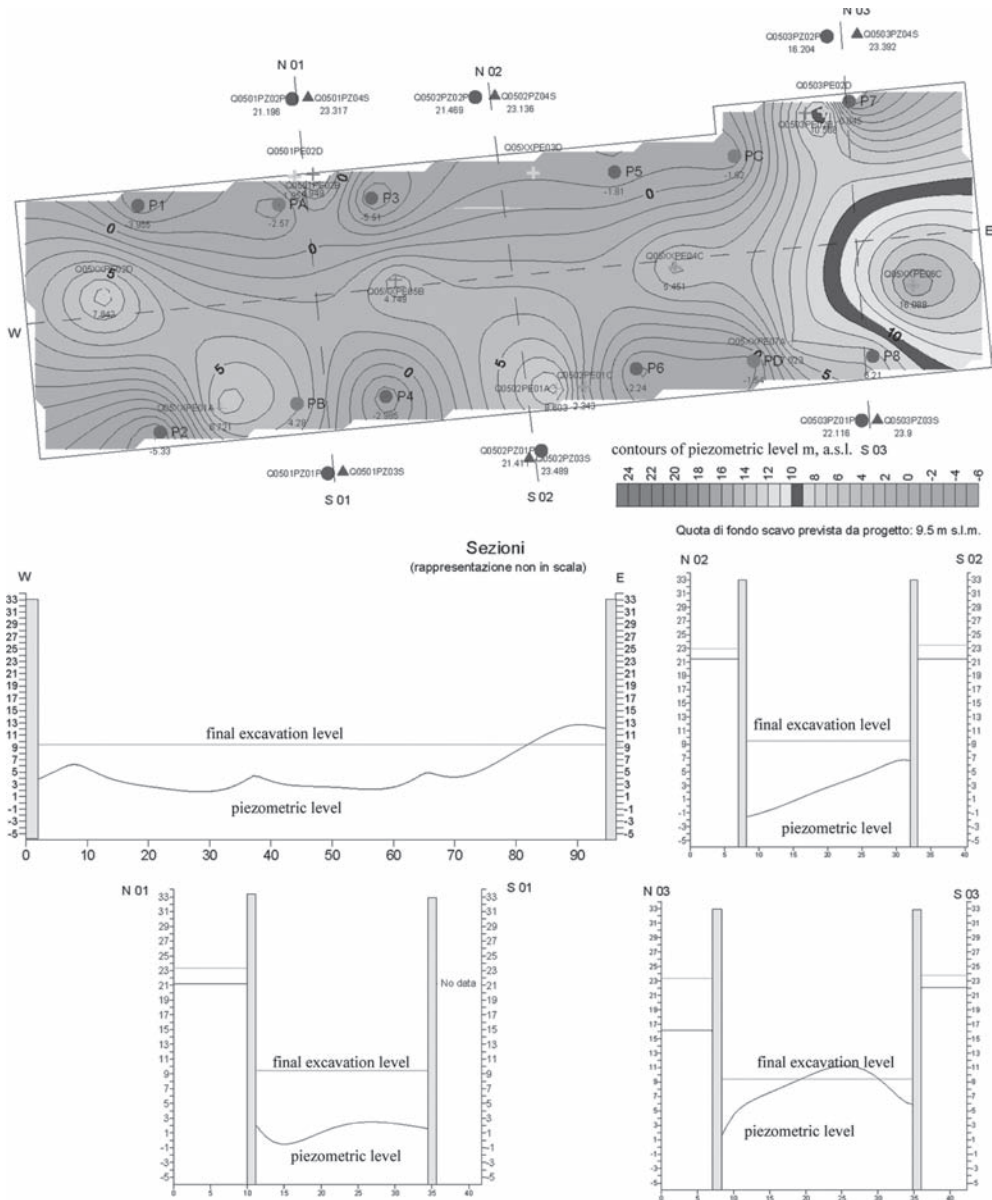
Lowering piezometric contours planning inside the TBM Malatesta Shaft and longitudinal/transversal dewatering sections during the test (IMG, 2008).
